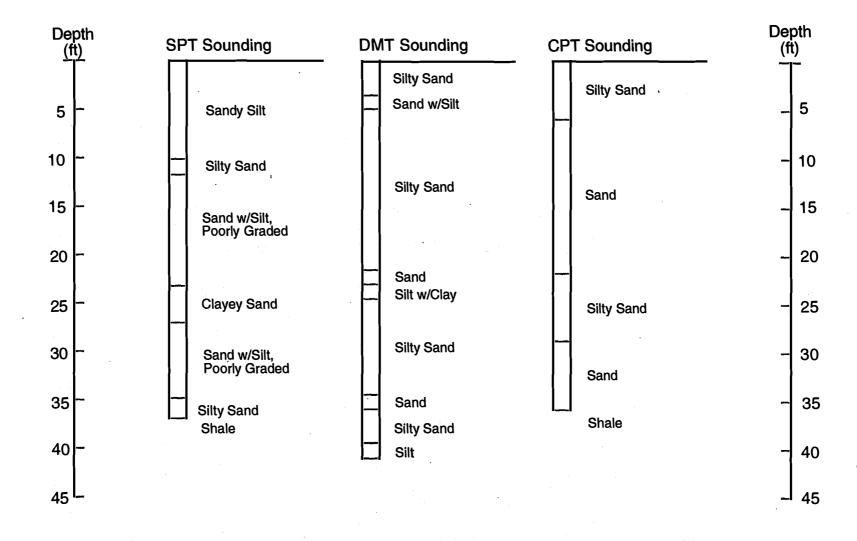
Soil Profile Based on In Situ Testing at Abutment B1
